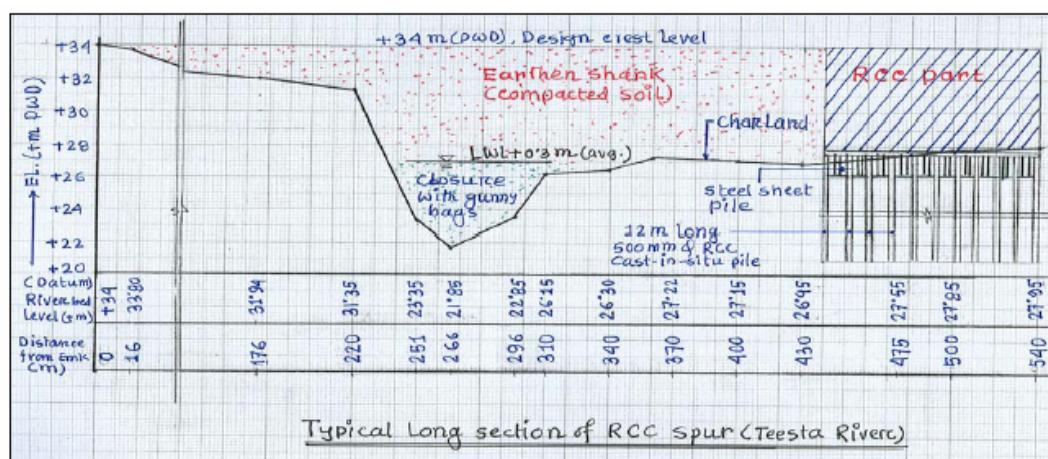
Typical long section of the RCC groyne (Source: Uddin 2007)
